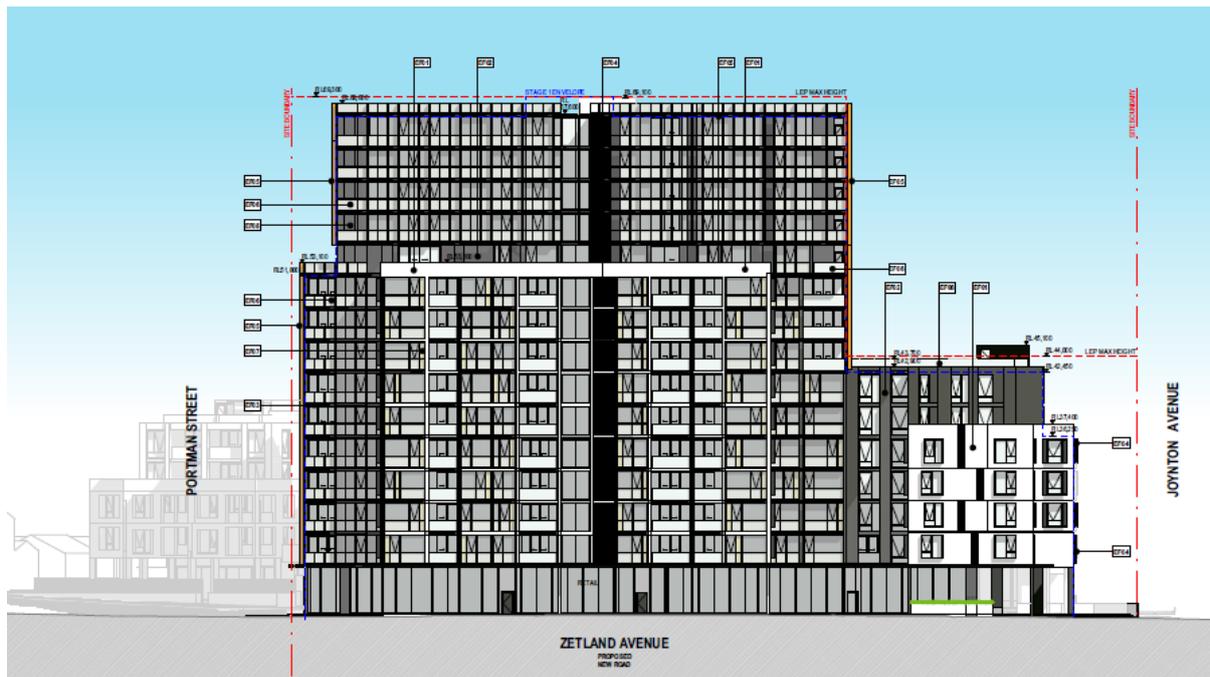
Zetland Avenue elevation of Building A as originally lodged.
